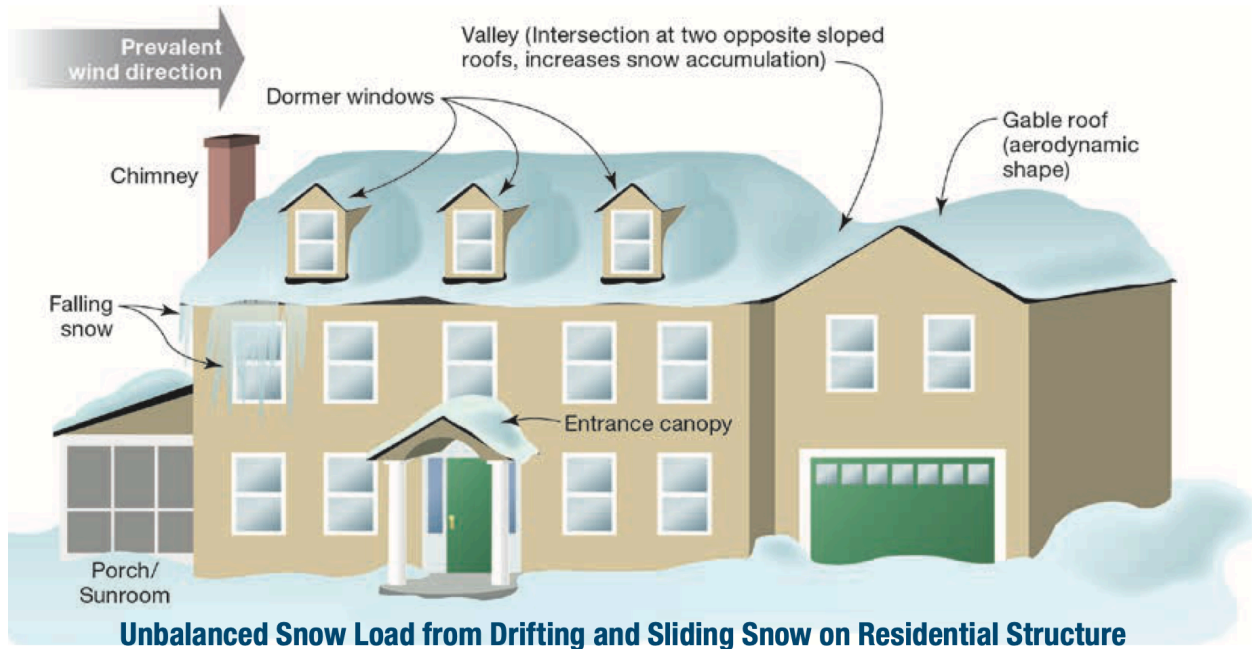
Unbalanced snow load from drifting and sliding snow on residential structure.
